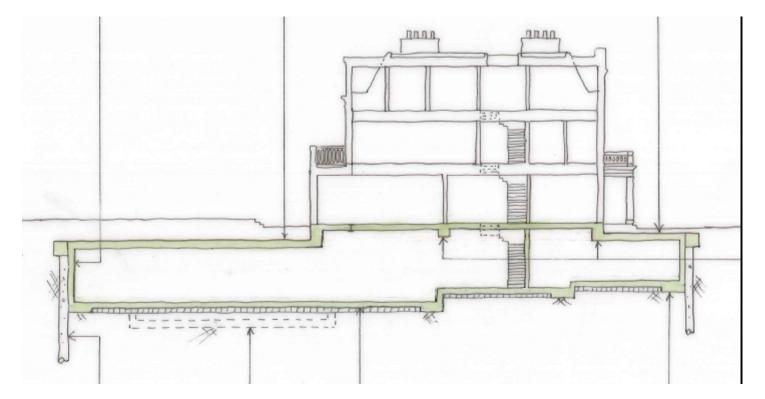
Proposed Basement Plan and Section (Extracts from EW sketches 2150623/S.90 and S.200)
